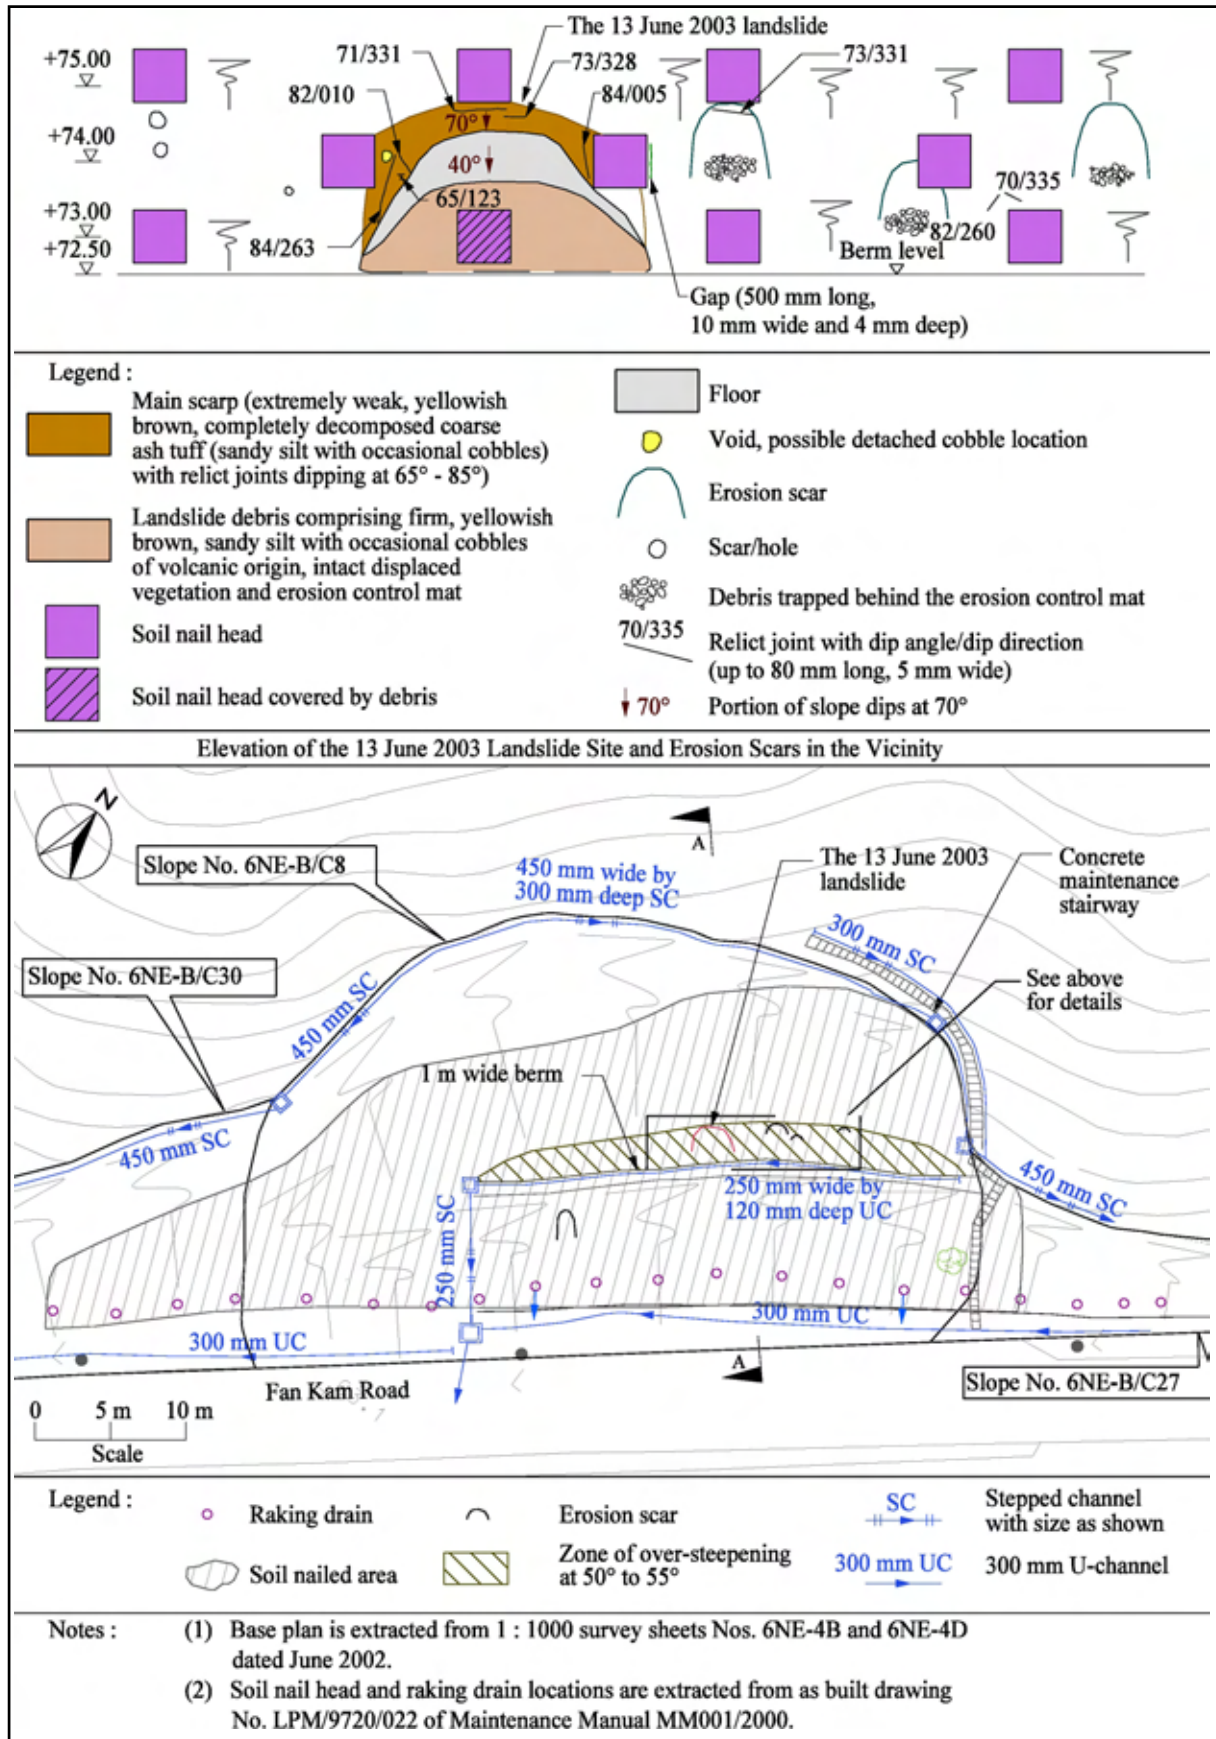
Site Observations (Slope No. 6NE-B/C8)
